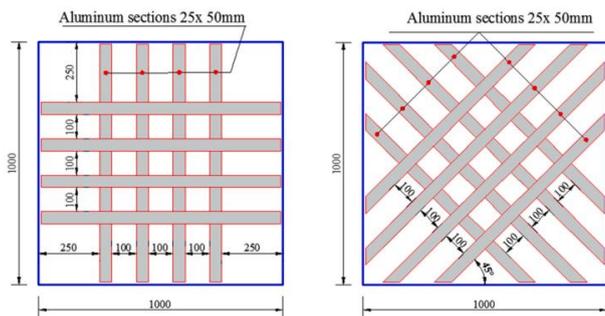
Utilizing of aluminum sections for improve shear punching [83].
